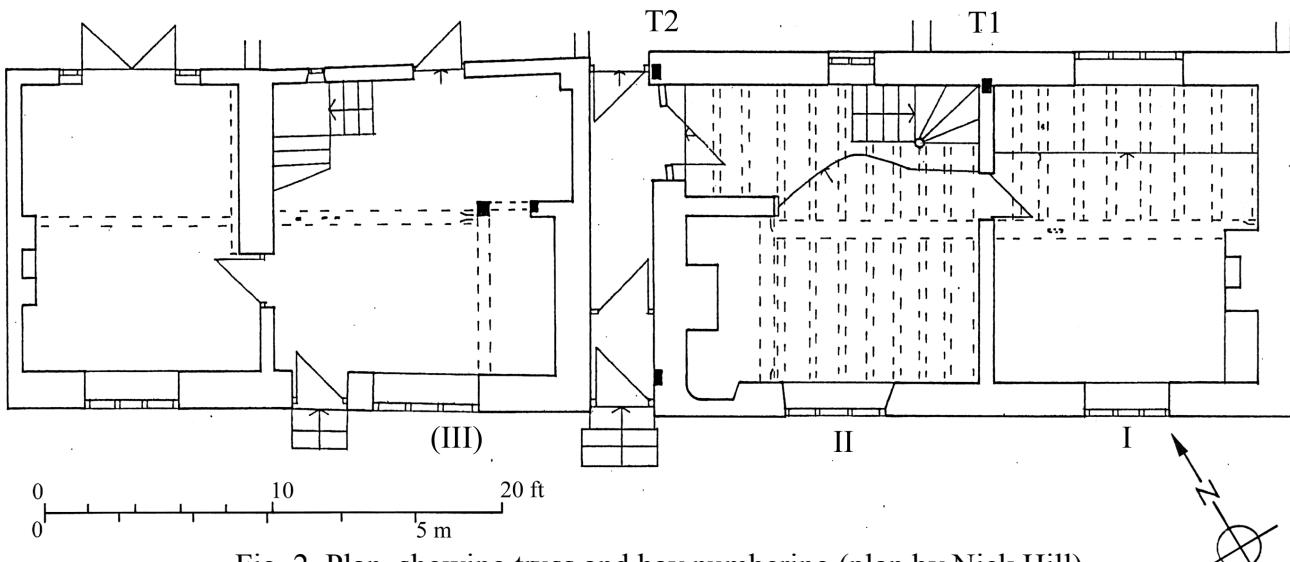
Plan, showing truss and bay numbering (plan by Nick Hill).
